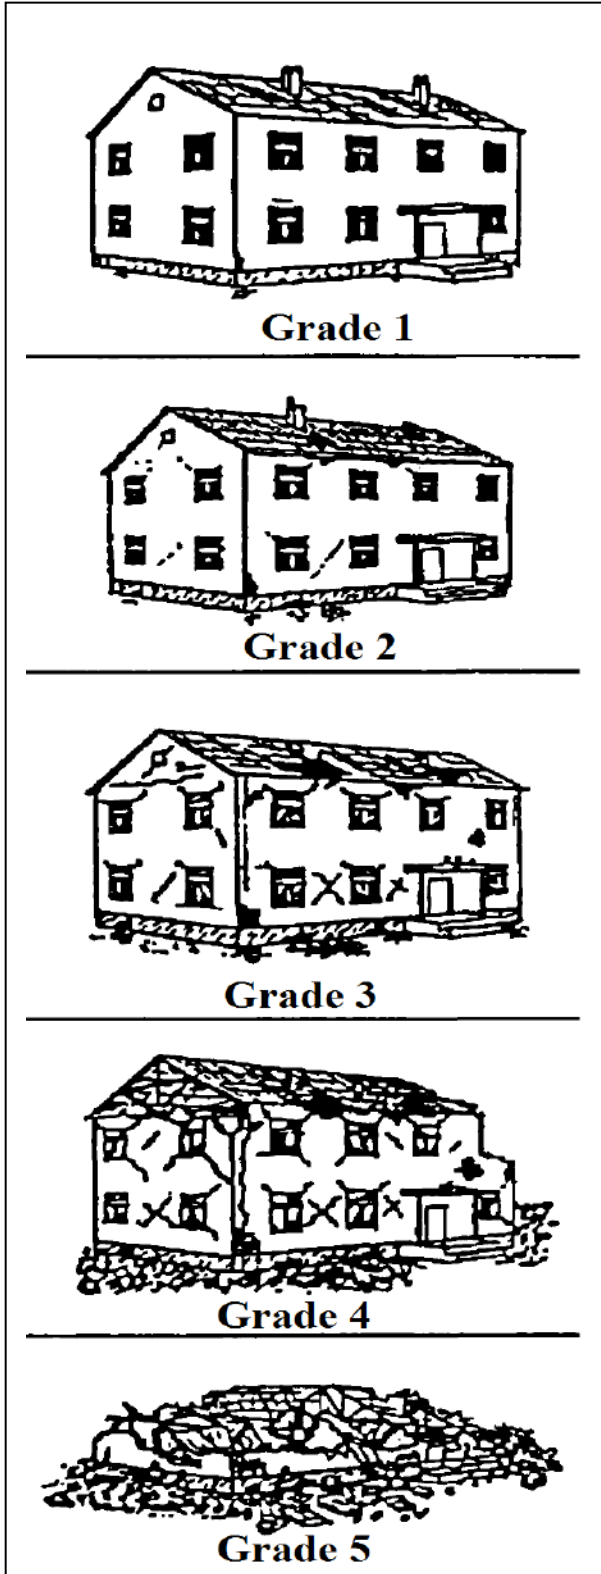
Damage classification of the masonry buildings [33].
